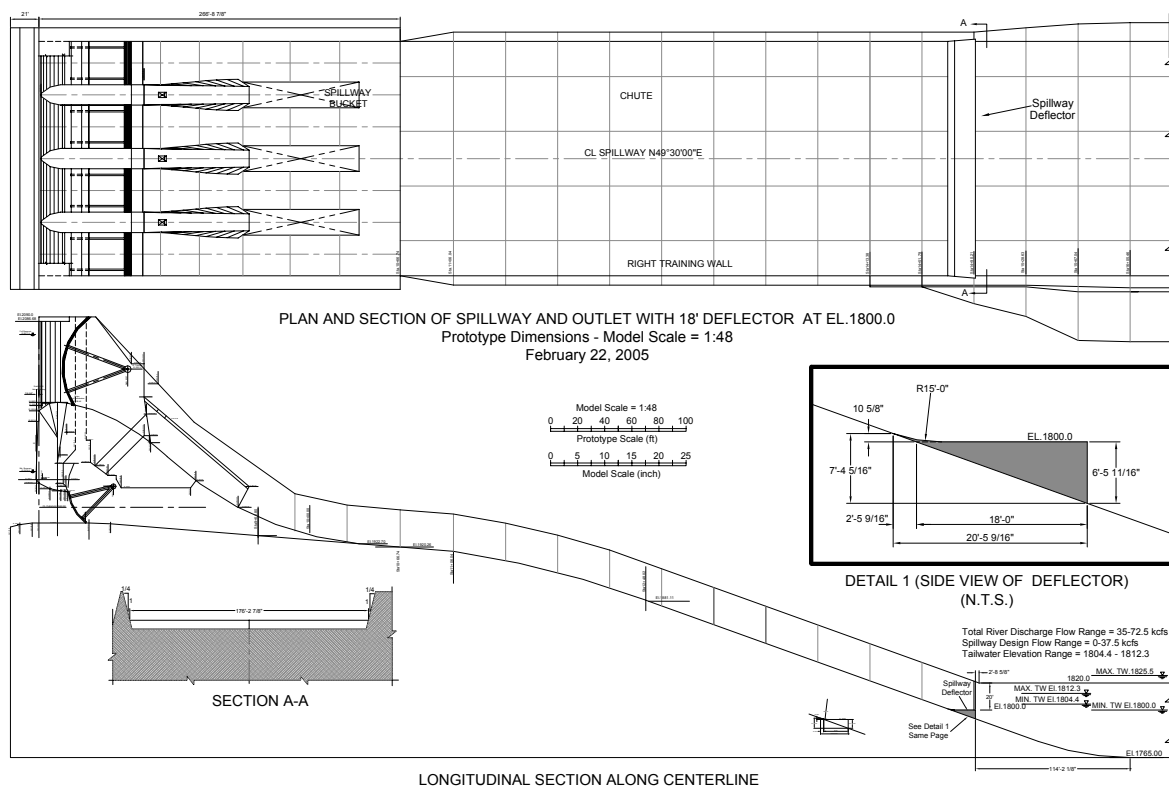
Plan and section views of the spillway and 18-foot deflector
